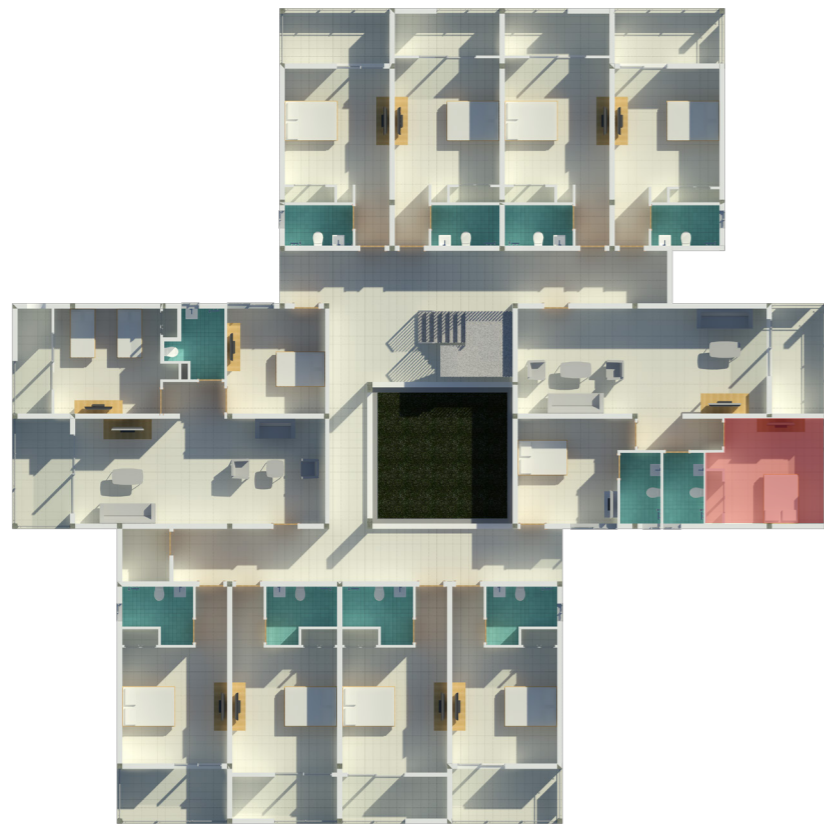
Floor plan location of rooms 9, 23 and 38. Source: Own
